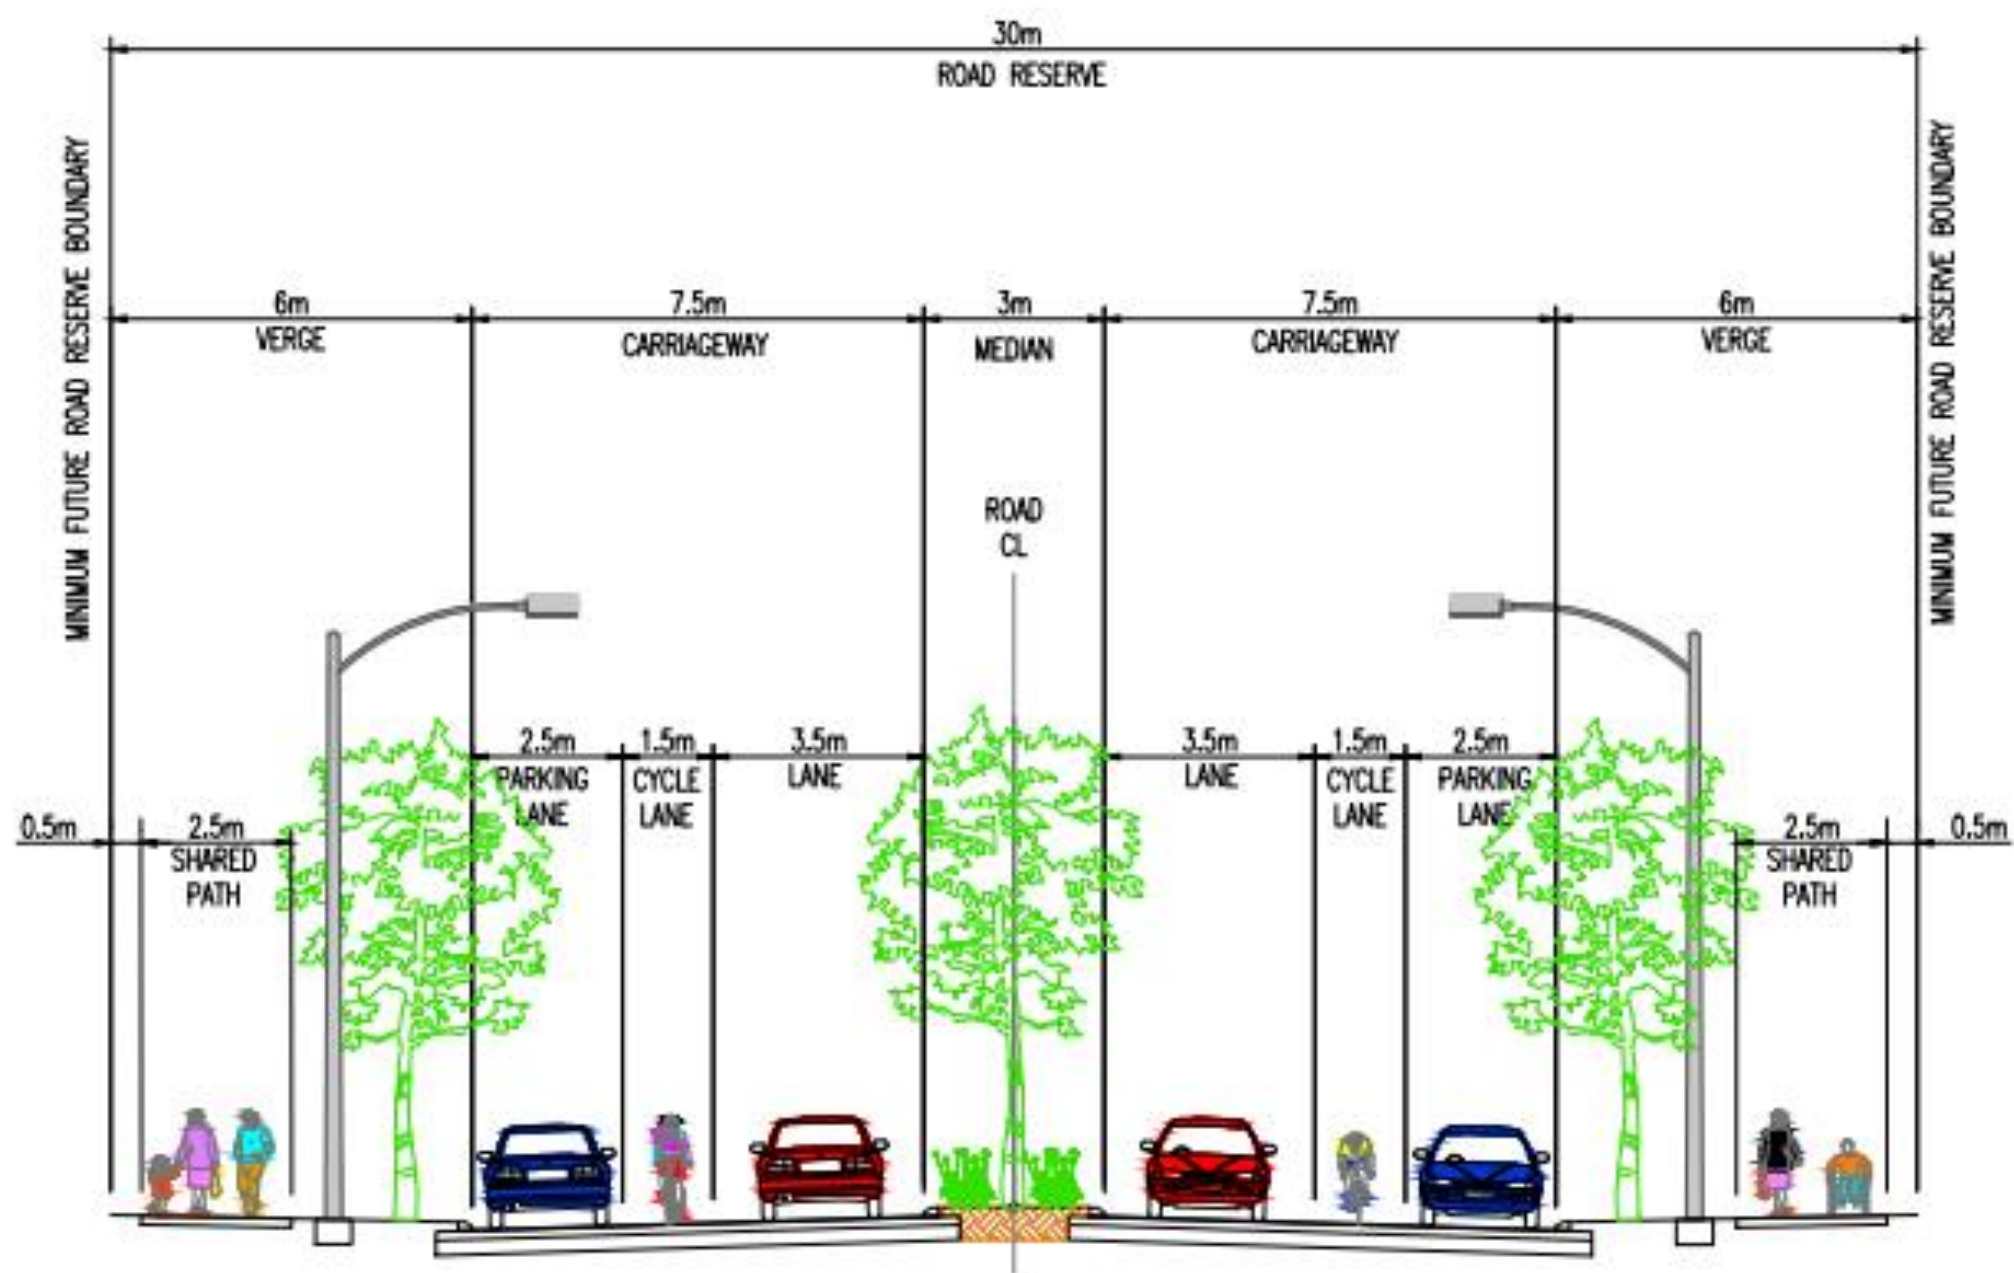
CROSS SECTION OF NEIGHBOURHOOD CONNECTOR A
